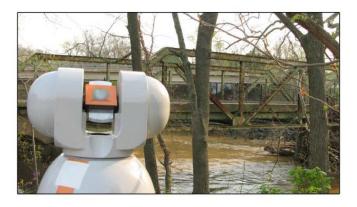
BRIDGE RLS measuring the Goose Creek Truss Bridge.
